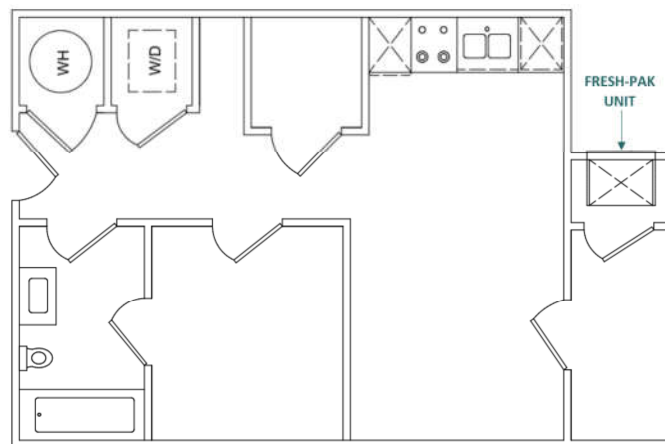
Condo with FRESH-PAK on Exterior Wall
